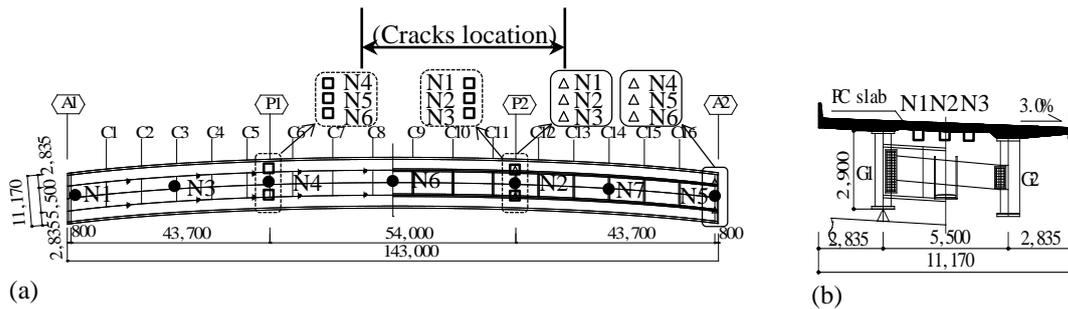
Bridge drawing and sensor setting cases (a) plan of the bridge (b) cross section of P2 (Case 1: ●, Case 2: □, Case 3: △).
